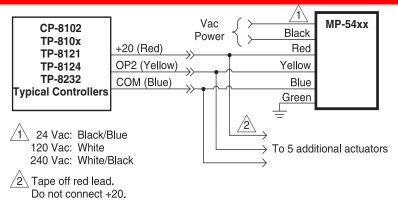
Typical Control Wiring for up to Six MP-54xx Series Actuators to Controllers Requiring External 20 Vdc Power Supply.
